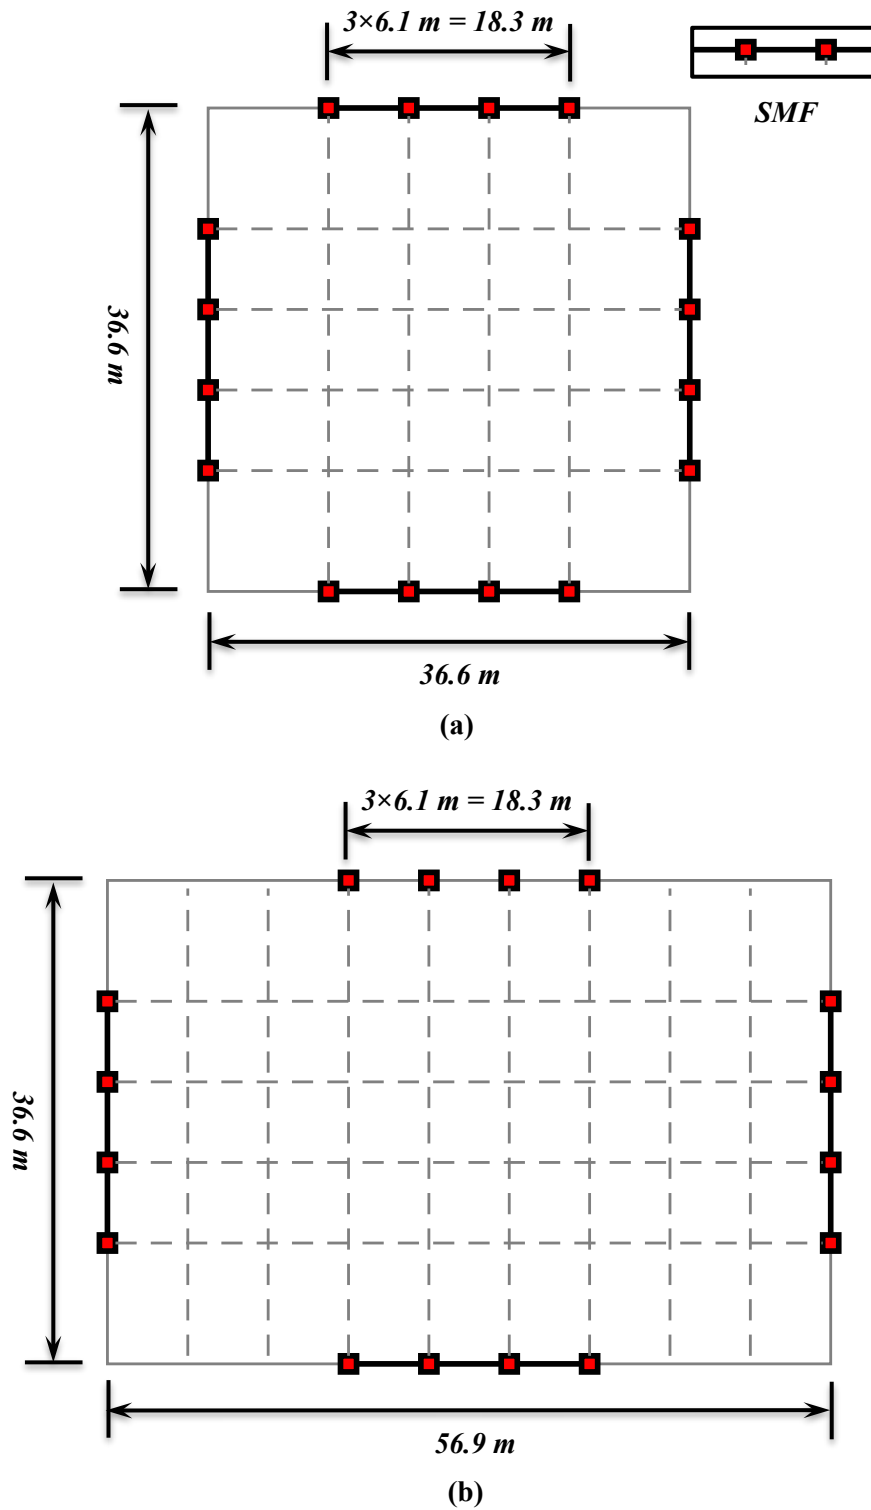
Plan layout of the reinforced concrete prototype buildings for: (a) RC-8 and RC-20, and (b) RC-4.
